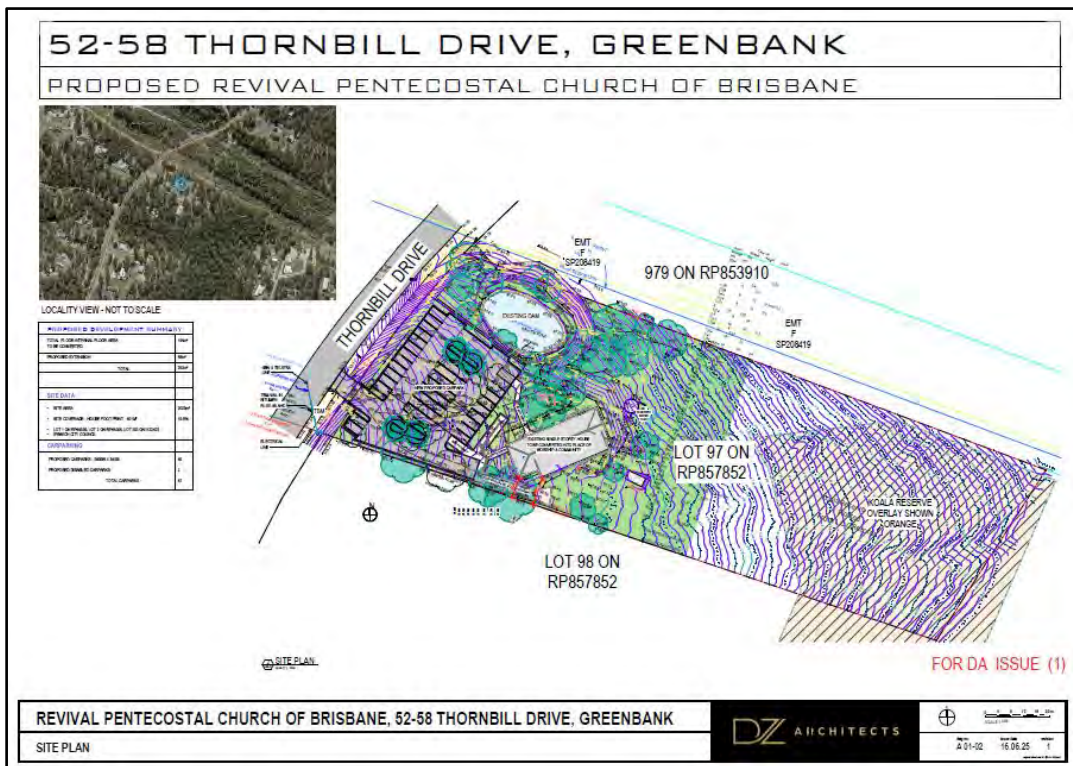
Proposed Site Plan (source: DZ Architects A 01-02, dated: 16/06/25)
